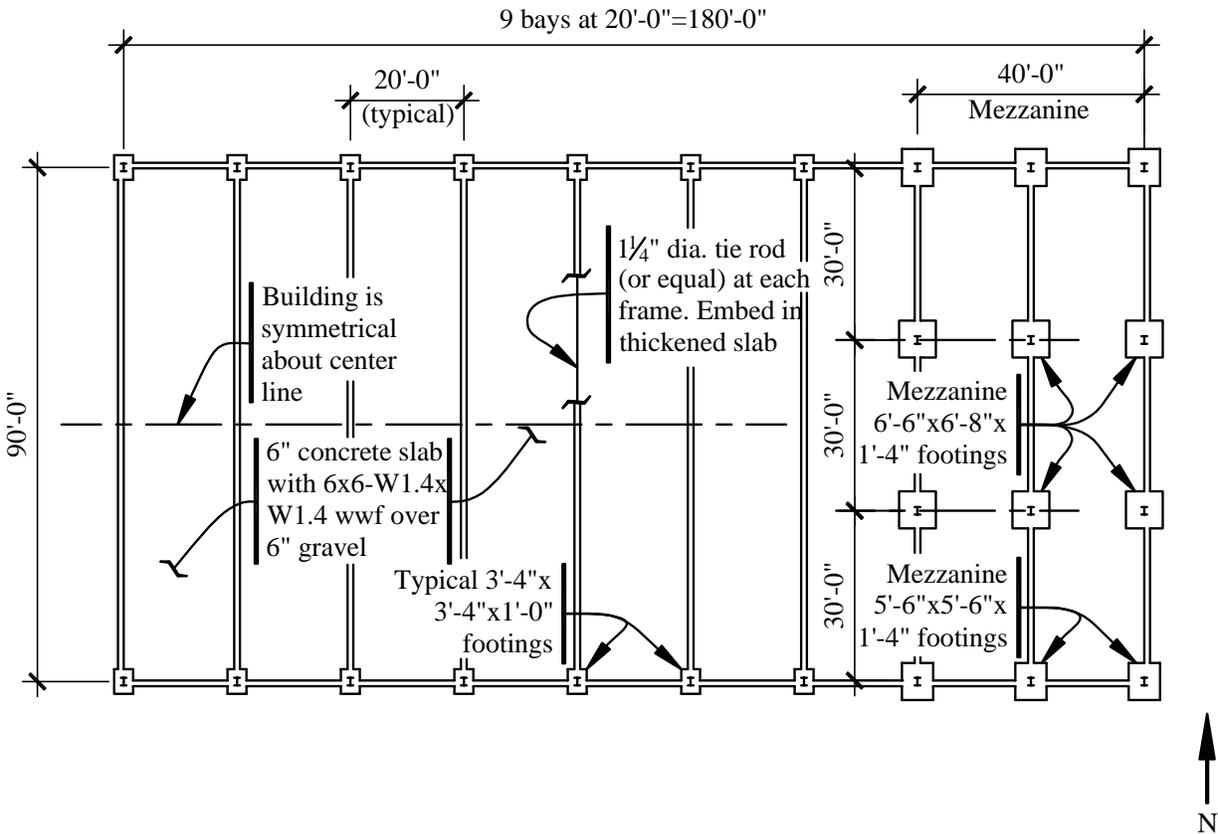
Foundation plan (1.0 in. = 25.4 mm, 1.0 ft = 0.3048 m).
